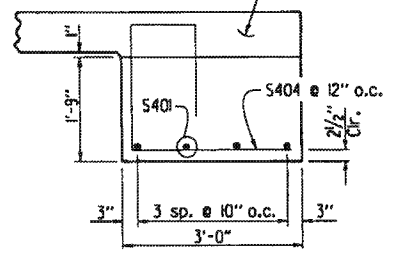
DETAILS OF LONGITUDINAL CONSTRUCTION JOINT
